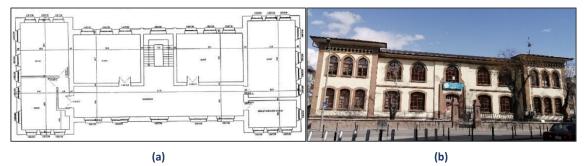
a) İsmet Paşa Primary School ground floor plan (Eroğlu, 2001) b) İsmet Paşa Primary School today (Tuna Sayın, 2021)
